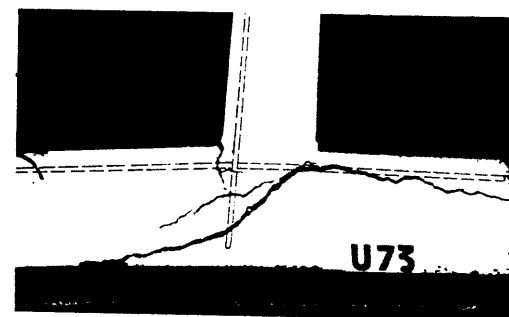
Diagonal Tension Crack Failure in Joint Caused by Bending Moment (Toe Was Pushed Off at Failure)
